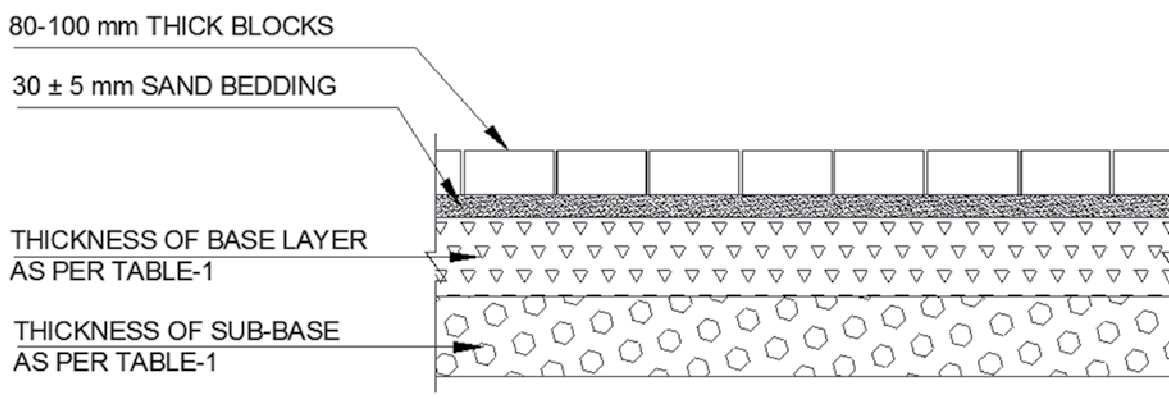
Typical Cross Section of Block Pavement for Medium and Heavily Trafficked Roads except National-Highways, Expressways, State Highways and MDR
